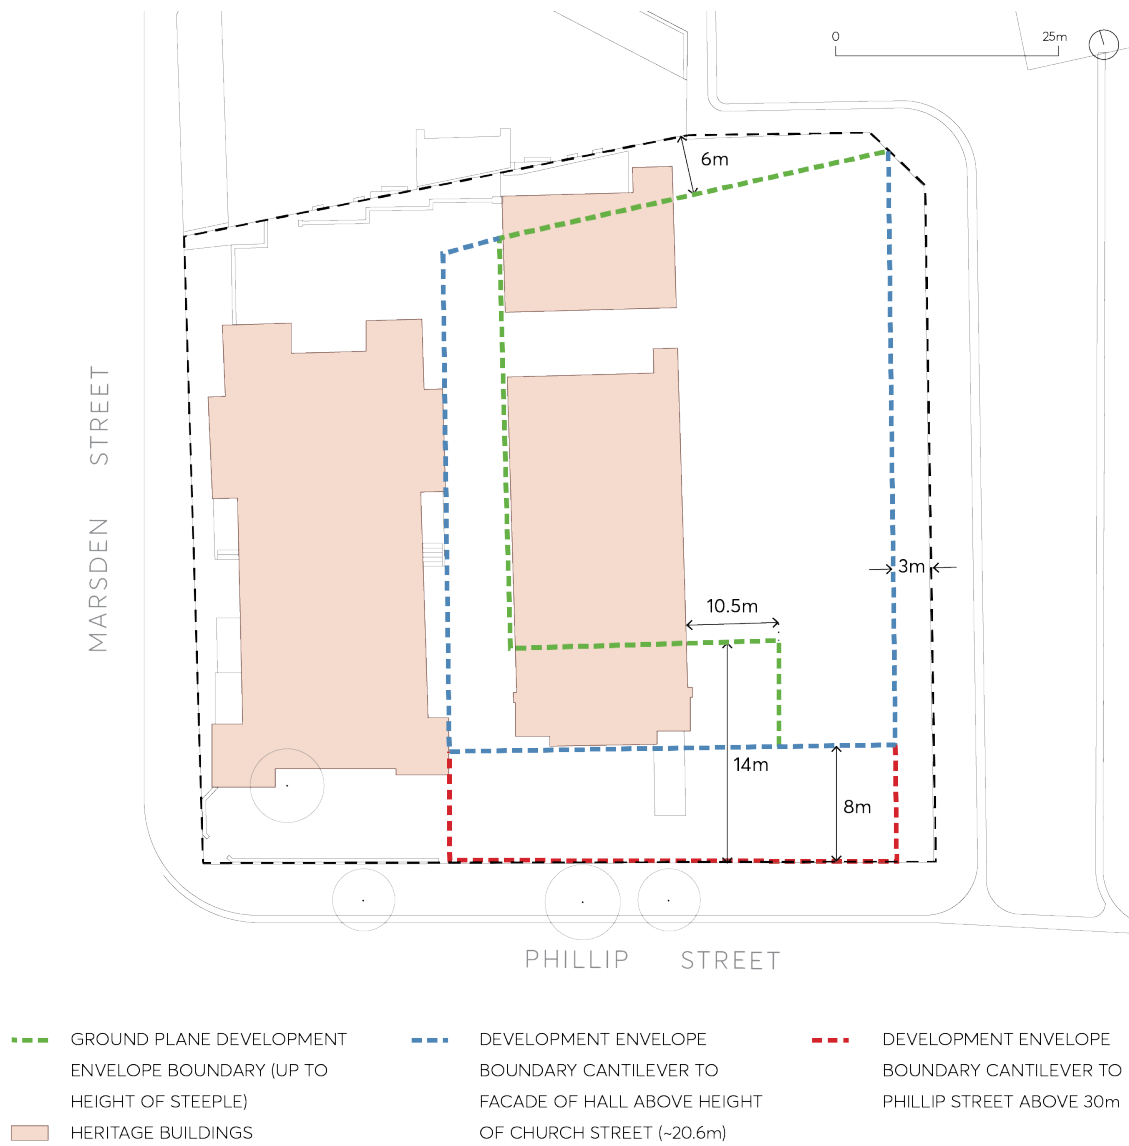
Existing ground floor plans with building guidelines (Source: TKD Architects)
